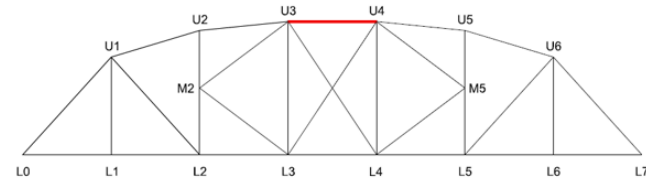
Overstressed Truss Members (Span 2) – Rehabilitation with Widening
